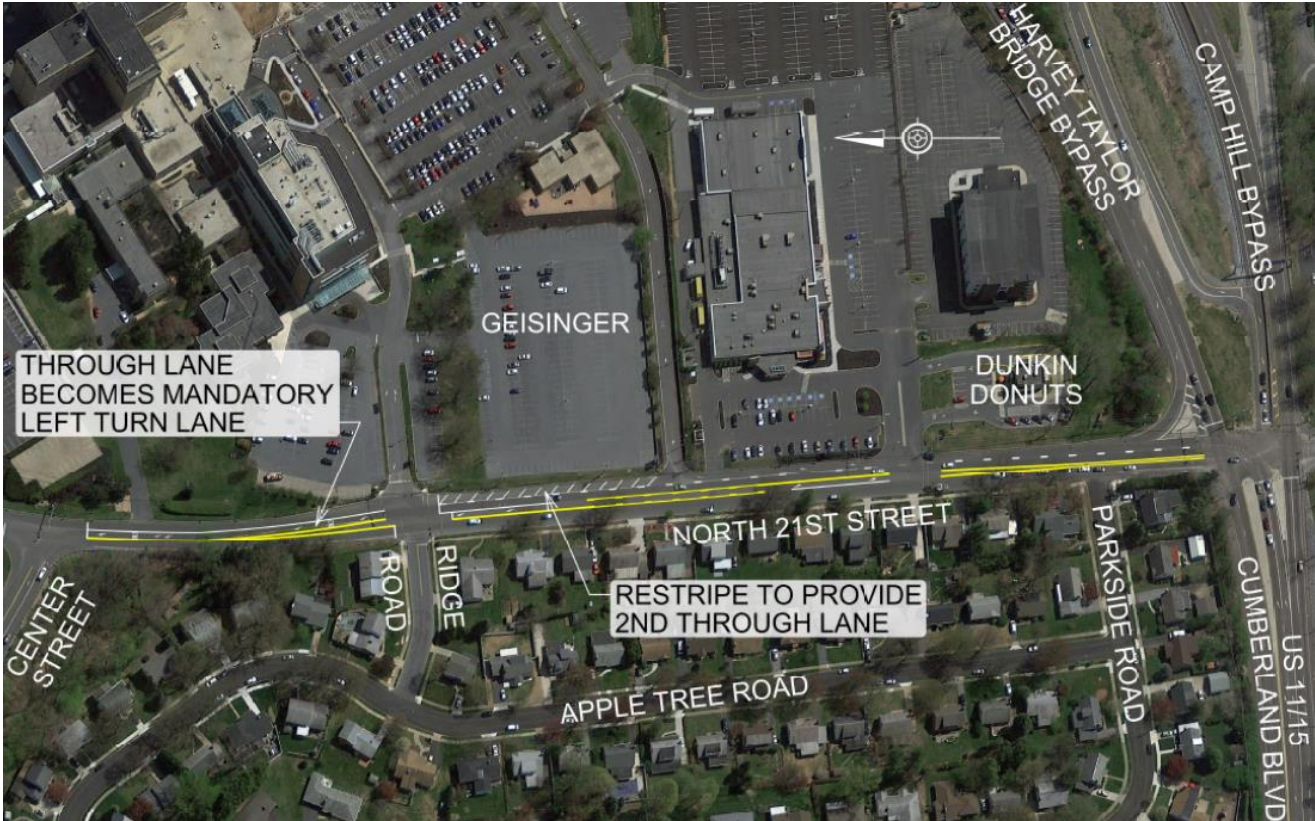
Proposed improvements on North 21st Street, Cumberland Boulevard to Center Street
